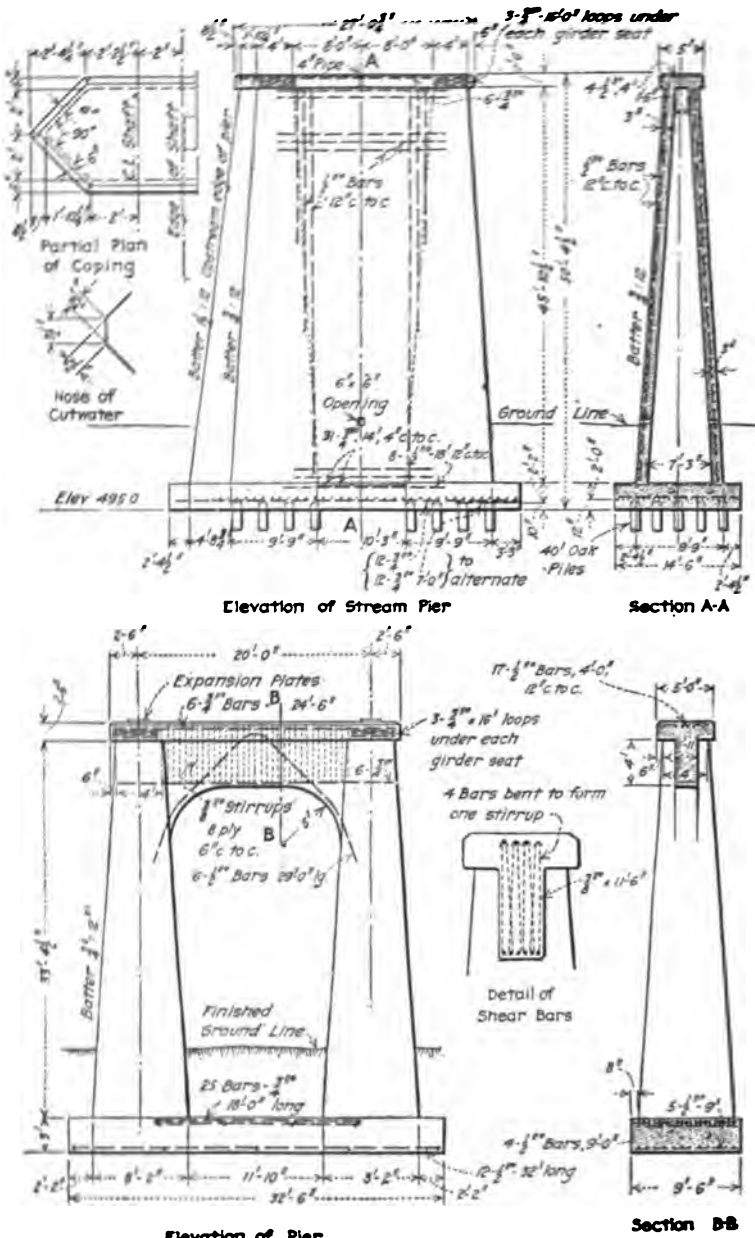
Details of typical piers, North Samuels Avenue viaduct, Fort Worth, Texas.
